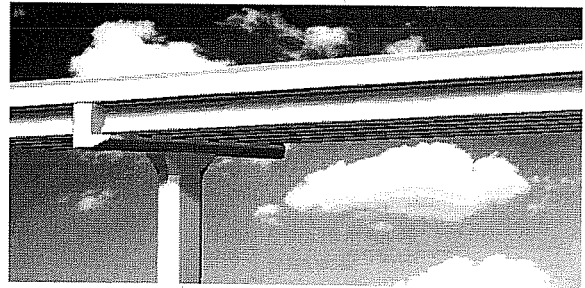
46 Precast concrete substructure systems can be efficiently fabricated and erected with attractive and durable results
